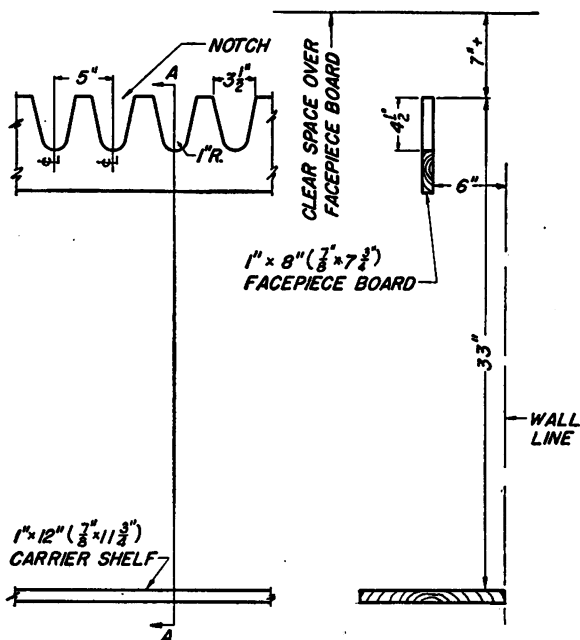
Gas mask storage rack for service masks. (Supports not shown for facepiece board and carrier shelf. All edges of facepiece board to have $\frac{1}{8}$ -inch R. chamfer. All lumber to be well seasoned and to be finished on all surfaces. Rack to be finished with 2 coats of paint.)
